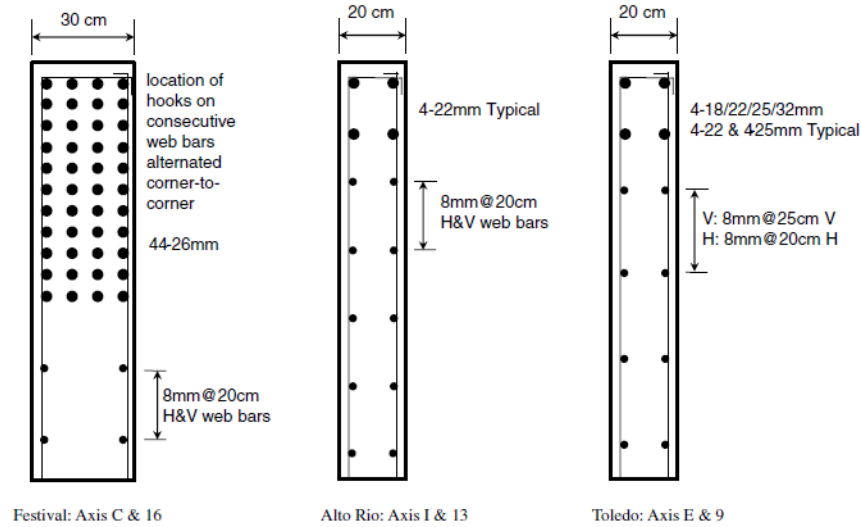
Typical wall boundaries: (a) Festival; (b) Alto Río; (c) Toledo.
